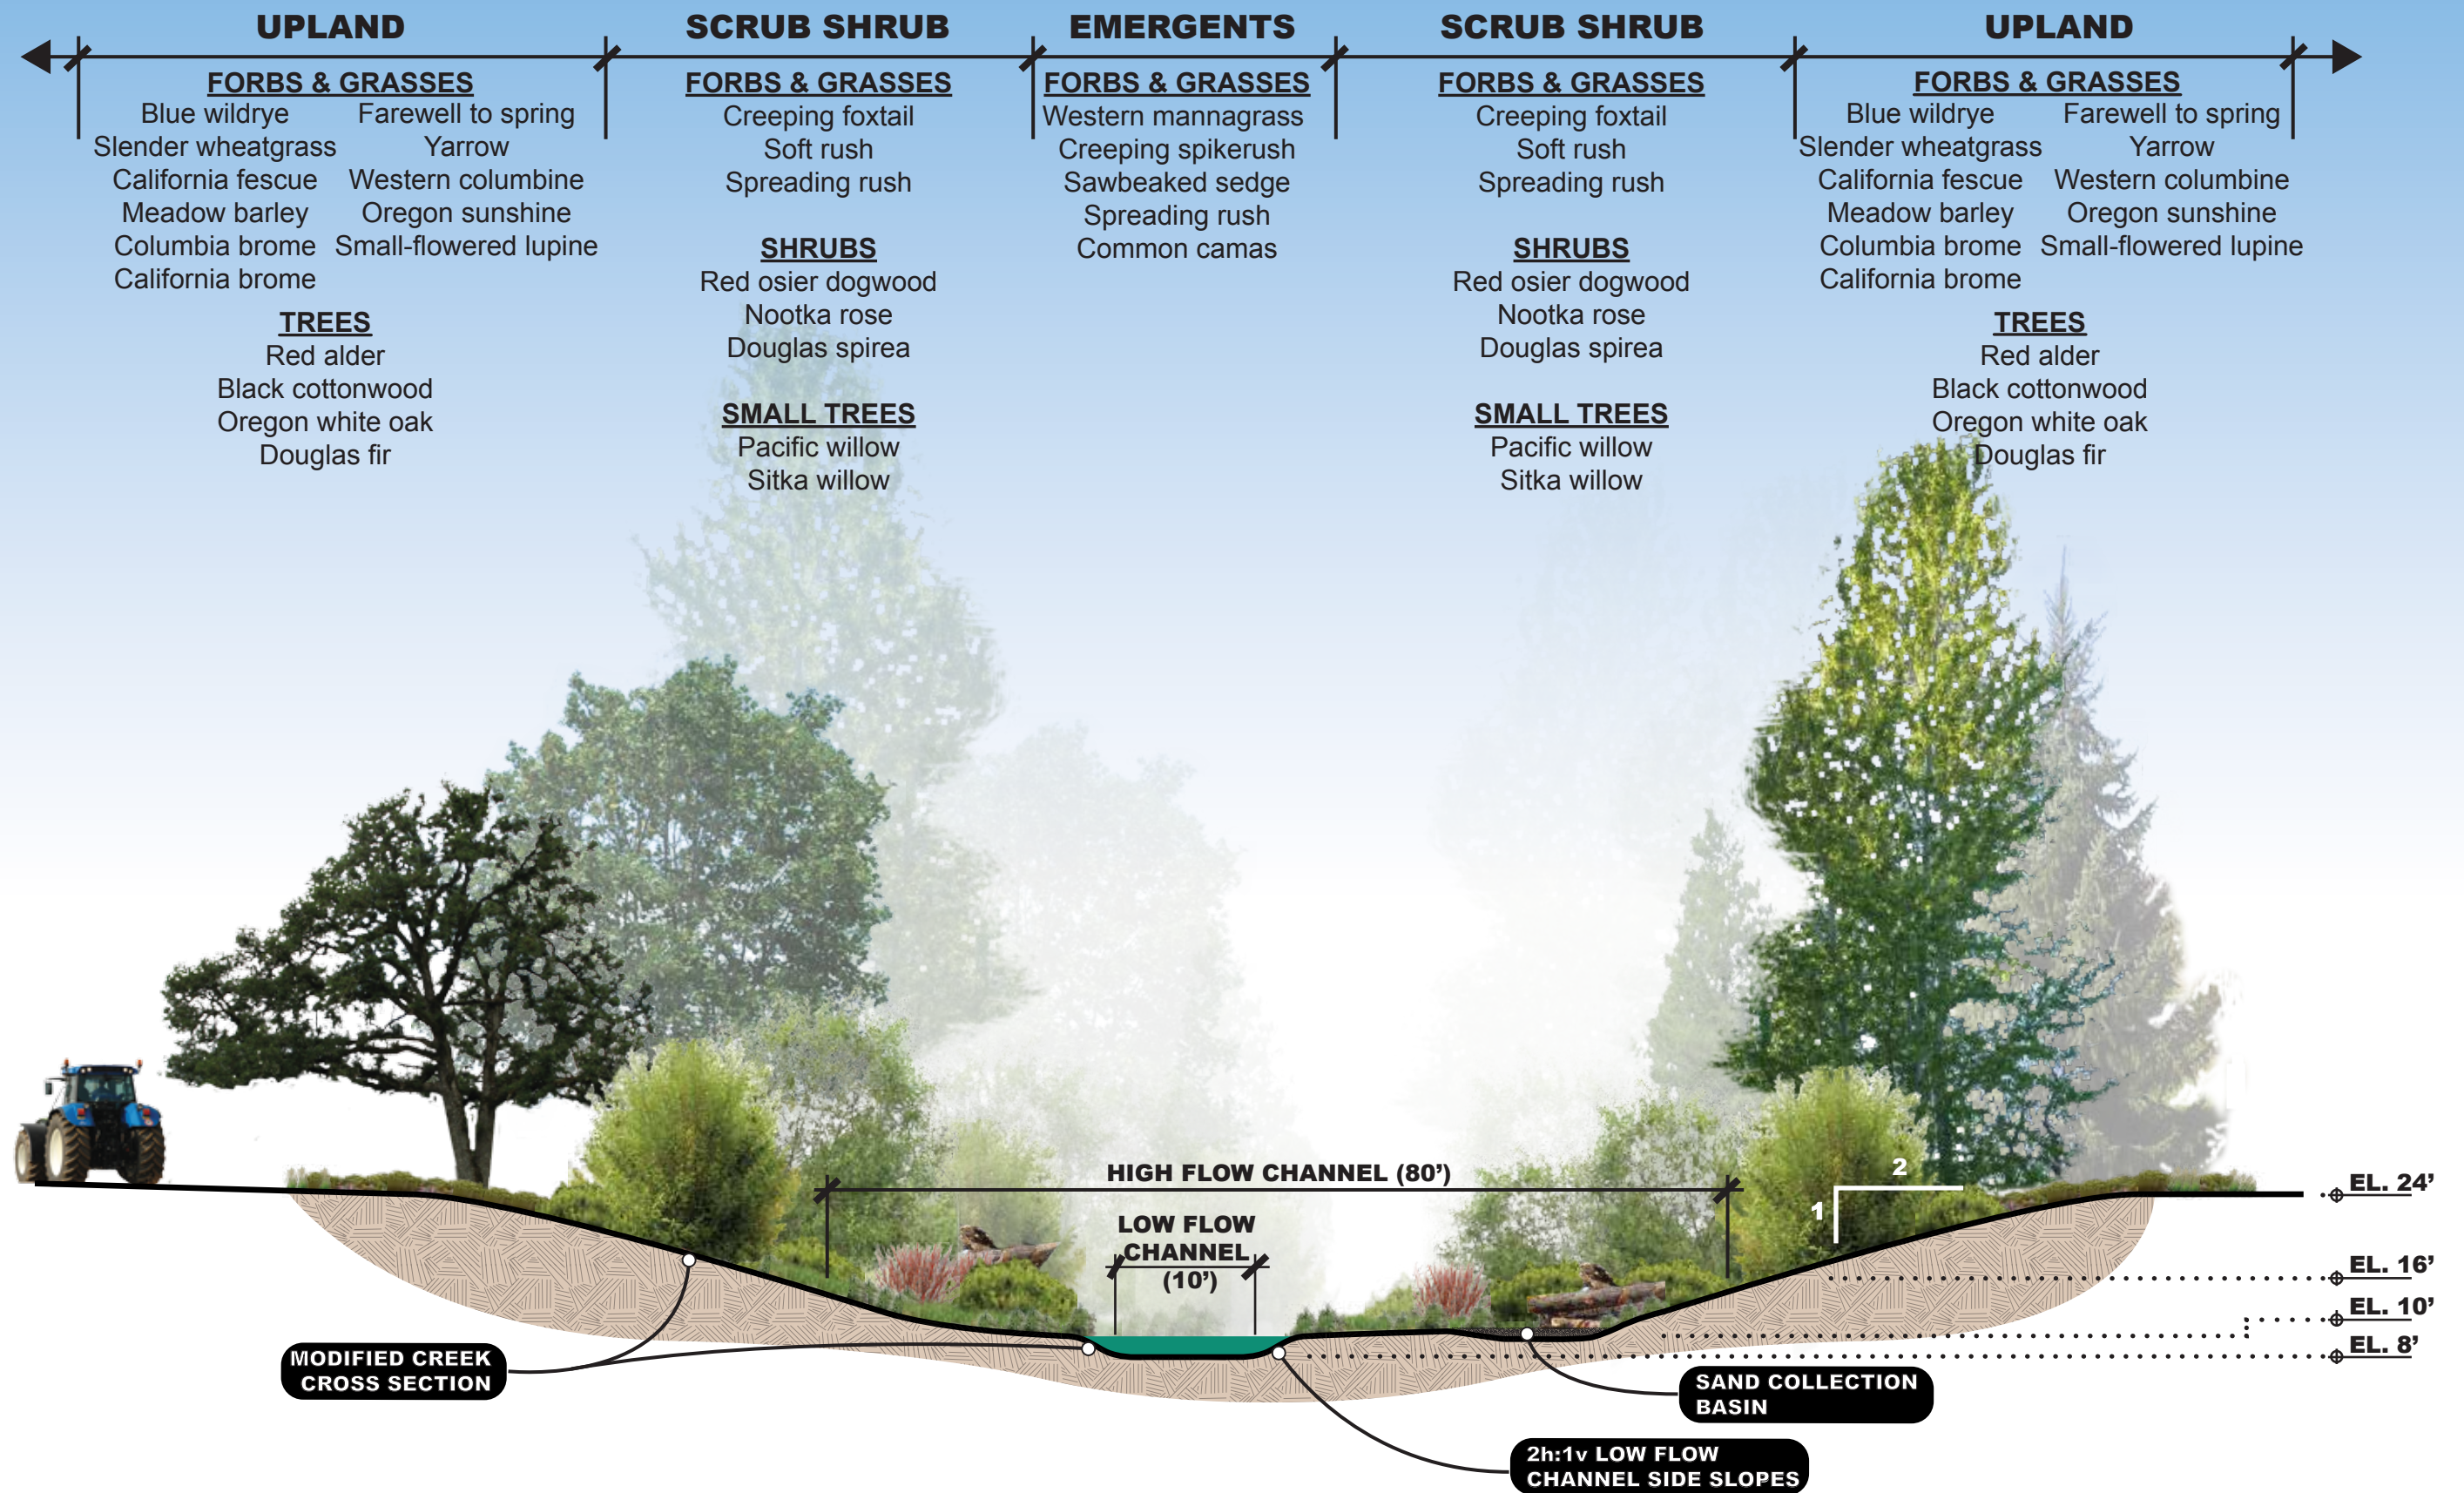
Typical Section of Proposed Improvements at Dairy Creek
